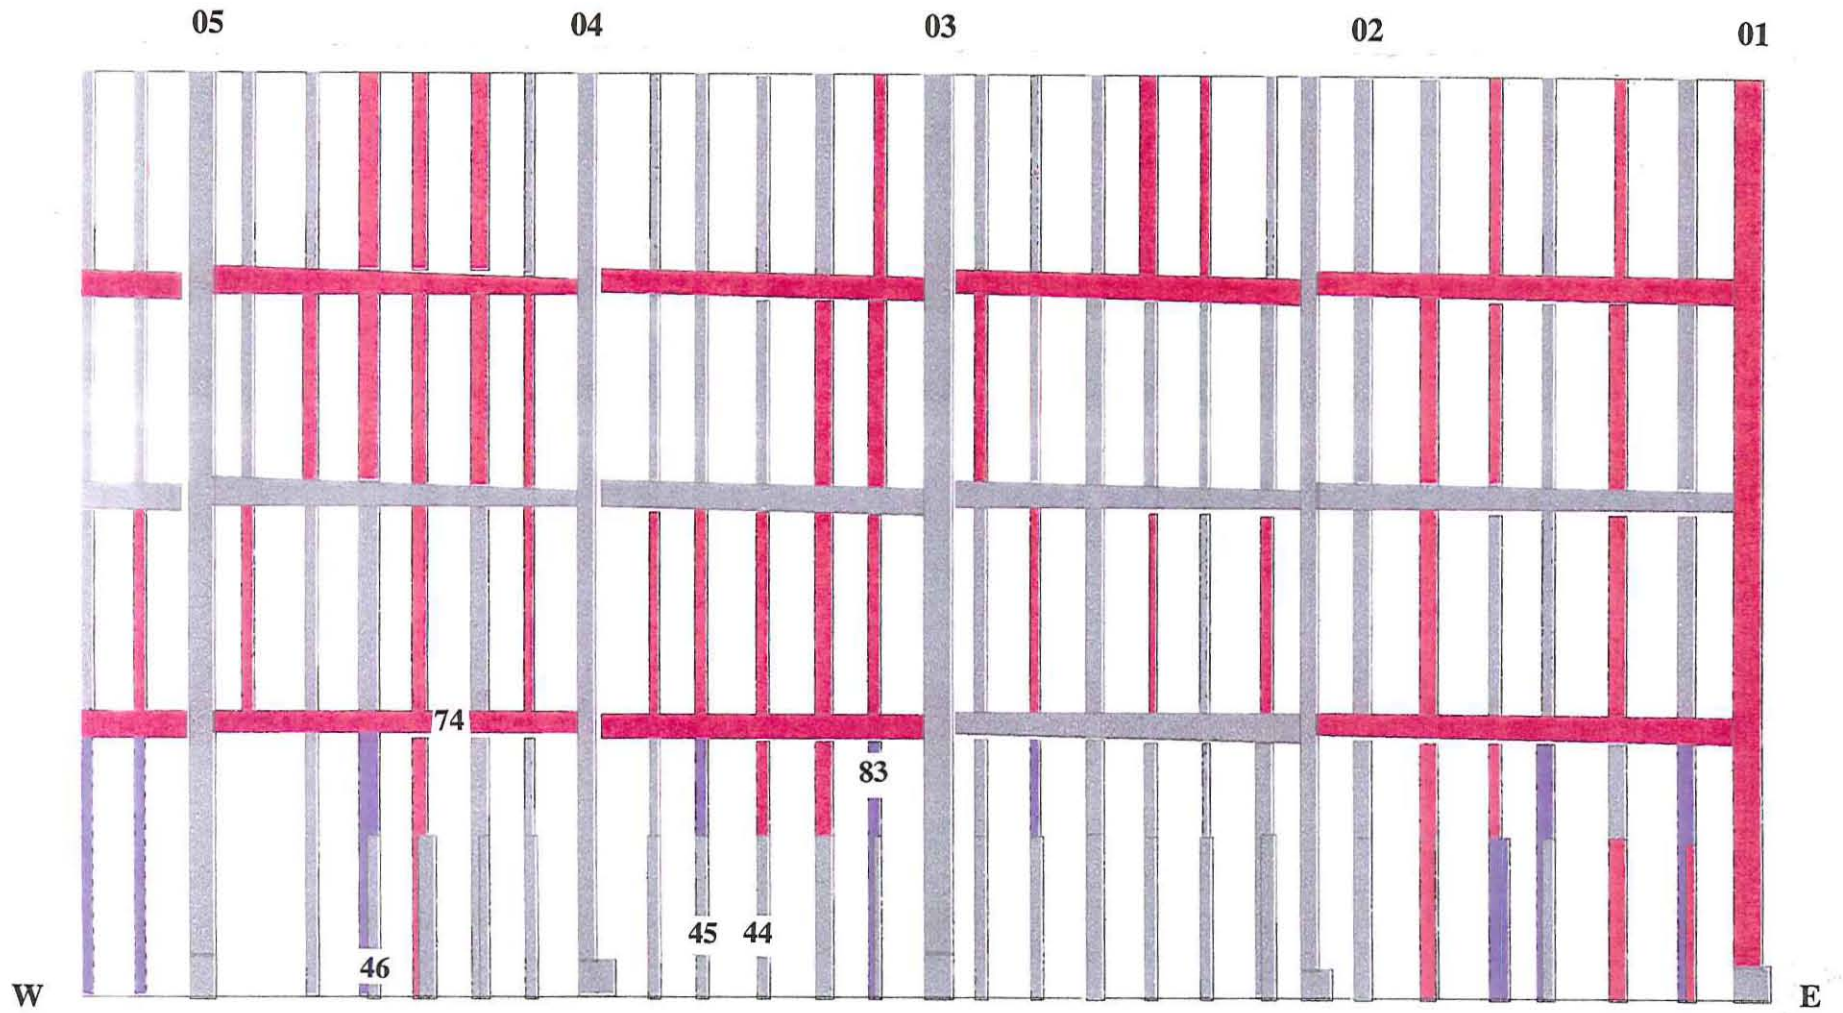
(1): South elevation of choir roof (eastern half) to show sample locations
